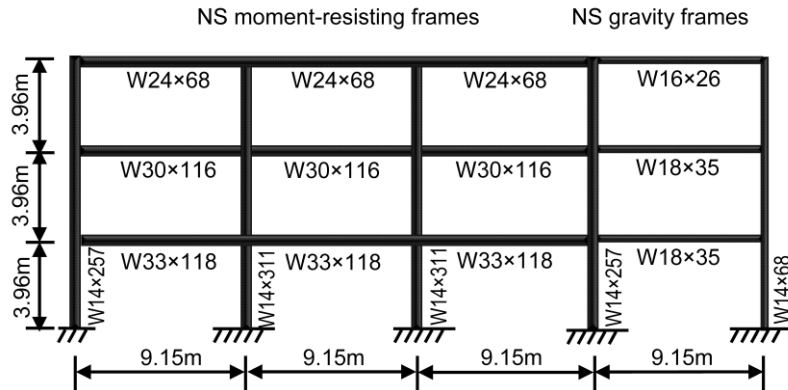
Elevation and member sizes of the LA 3-story Frame.
